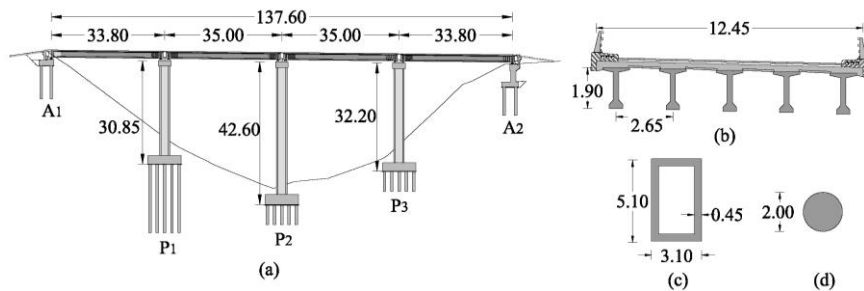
(a) Longitudinal section of the “reference” bridge, (b) Cross – section of the deck, (c) Cross – section of the piers of the “reference” bridge and (d) Cross-section of the piers of the ductile alteration of the “reference” bridge
